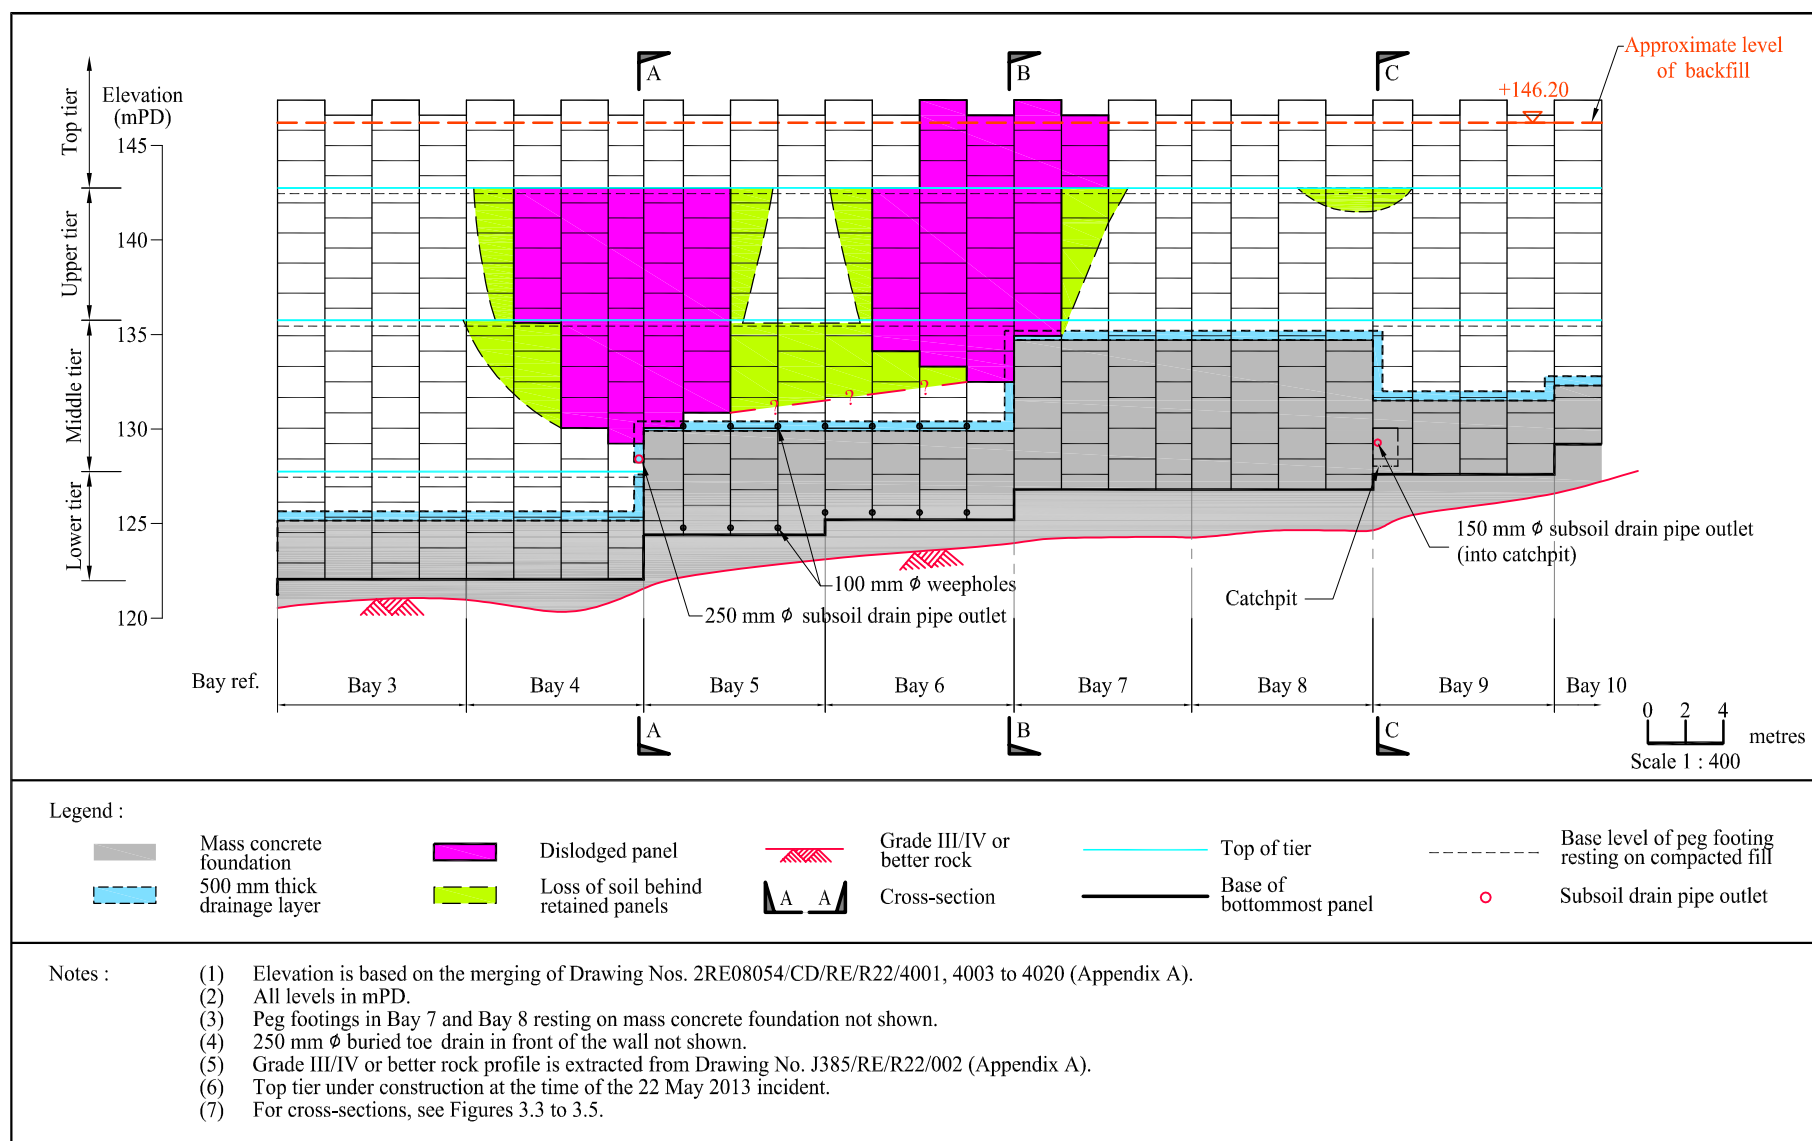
Elevation of the 22 May 2013 Incident at Wall R22
